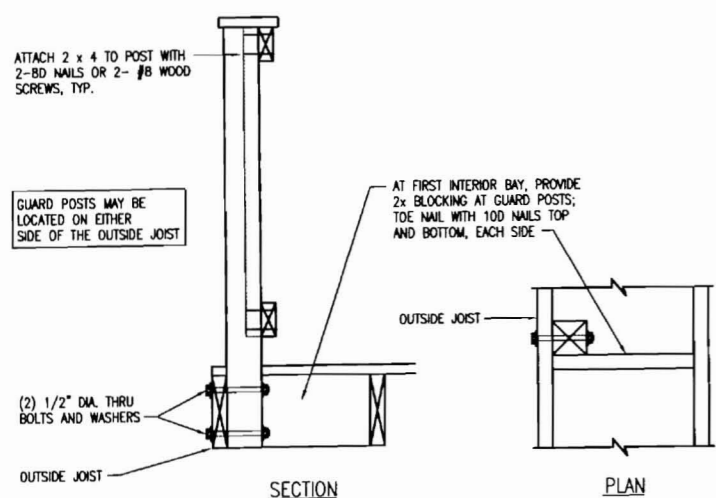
GUARD POST TO OUTSIDE JOIST DETAIL
